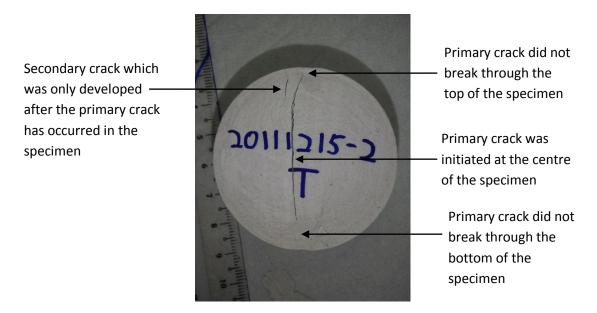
Example of a specimen where the location of crack initiation can be determined by physical inspection
